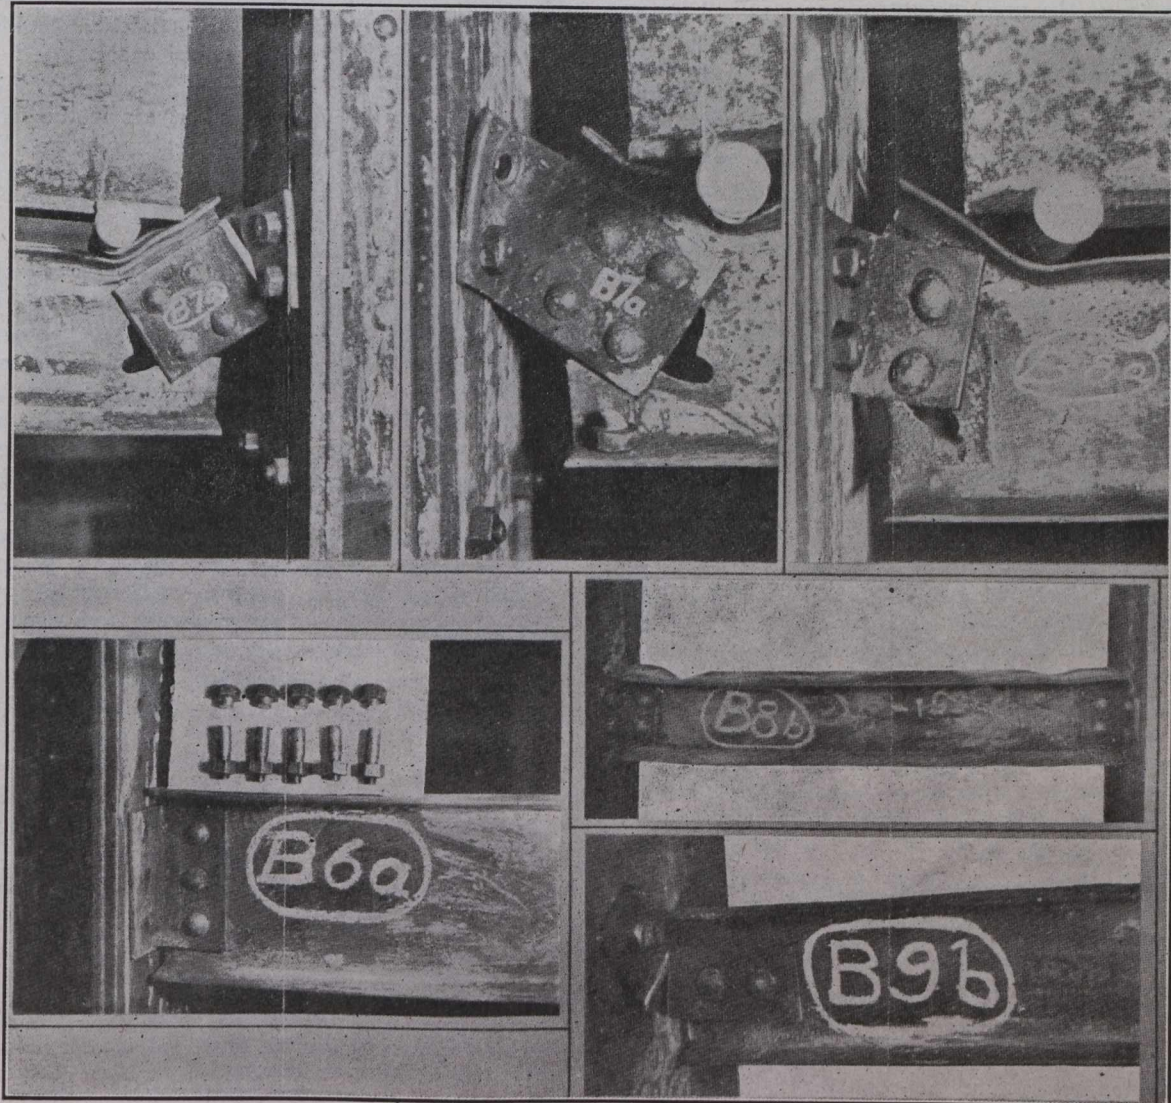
Showing Method of Applying Load and Manner of Failure of Test Pieces.
